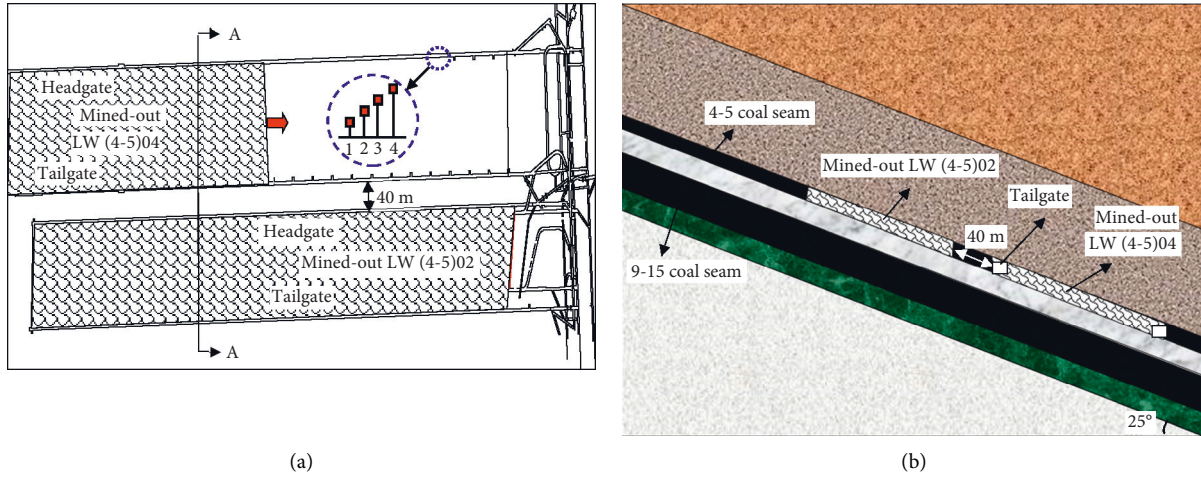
Cross-section detail of LW (4-5)04: (a) plane position map of working face; (b) A-A Section.
